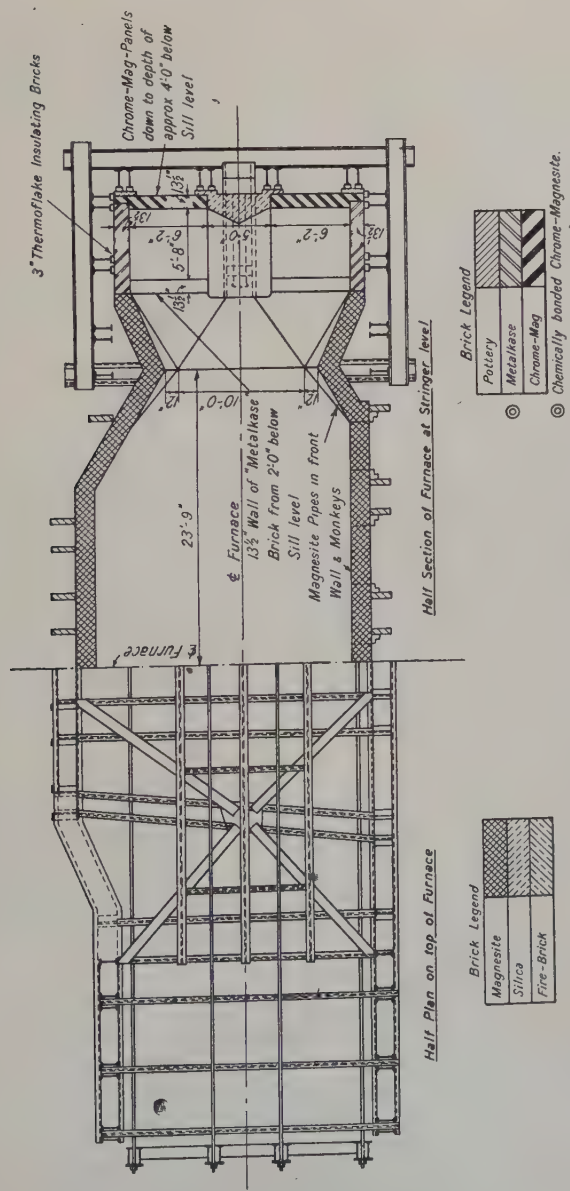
240-Ton Furnace. Half plan on top of furnace, and half section of furnace at stringer level.
